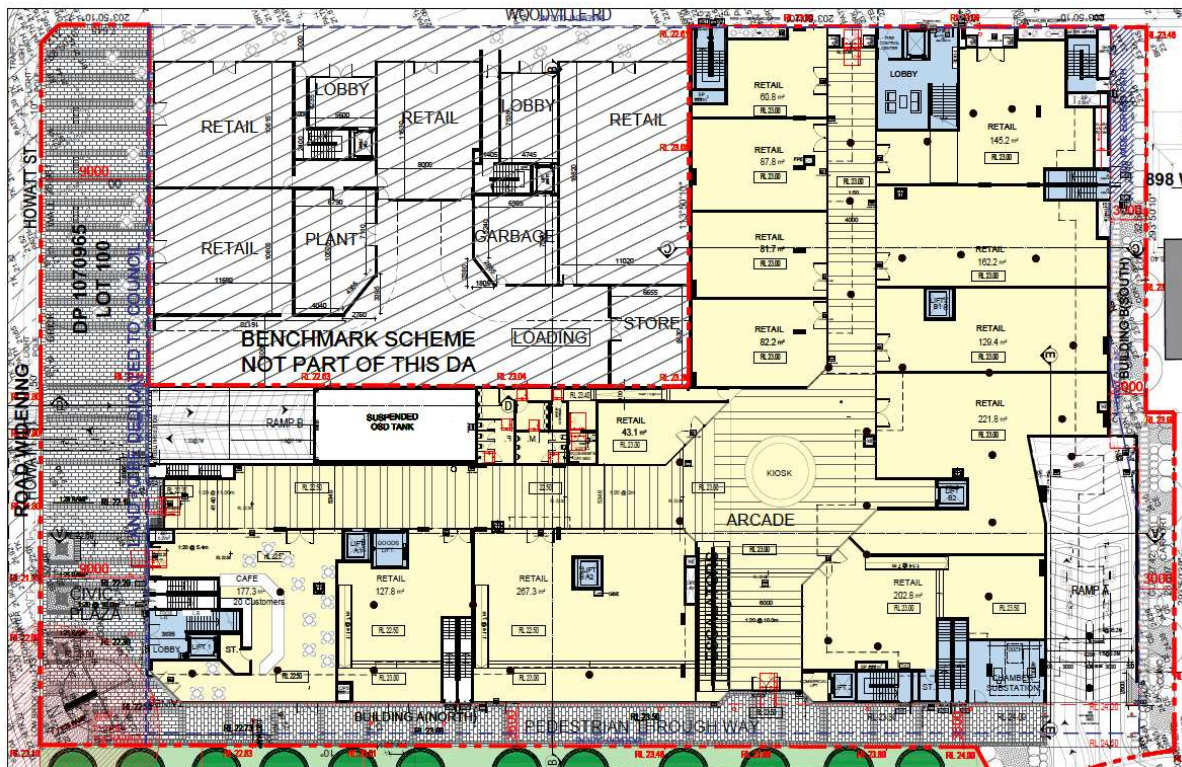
Proposed Ground Floor Plan including a concept illustrating how the neighbouring service station can be developed in future; and the land proposed to be dedicated to Council on the northern frontage of the site (shown to the left of the image).
